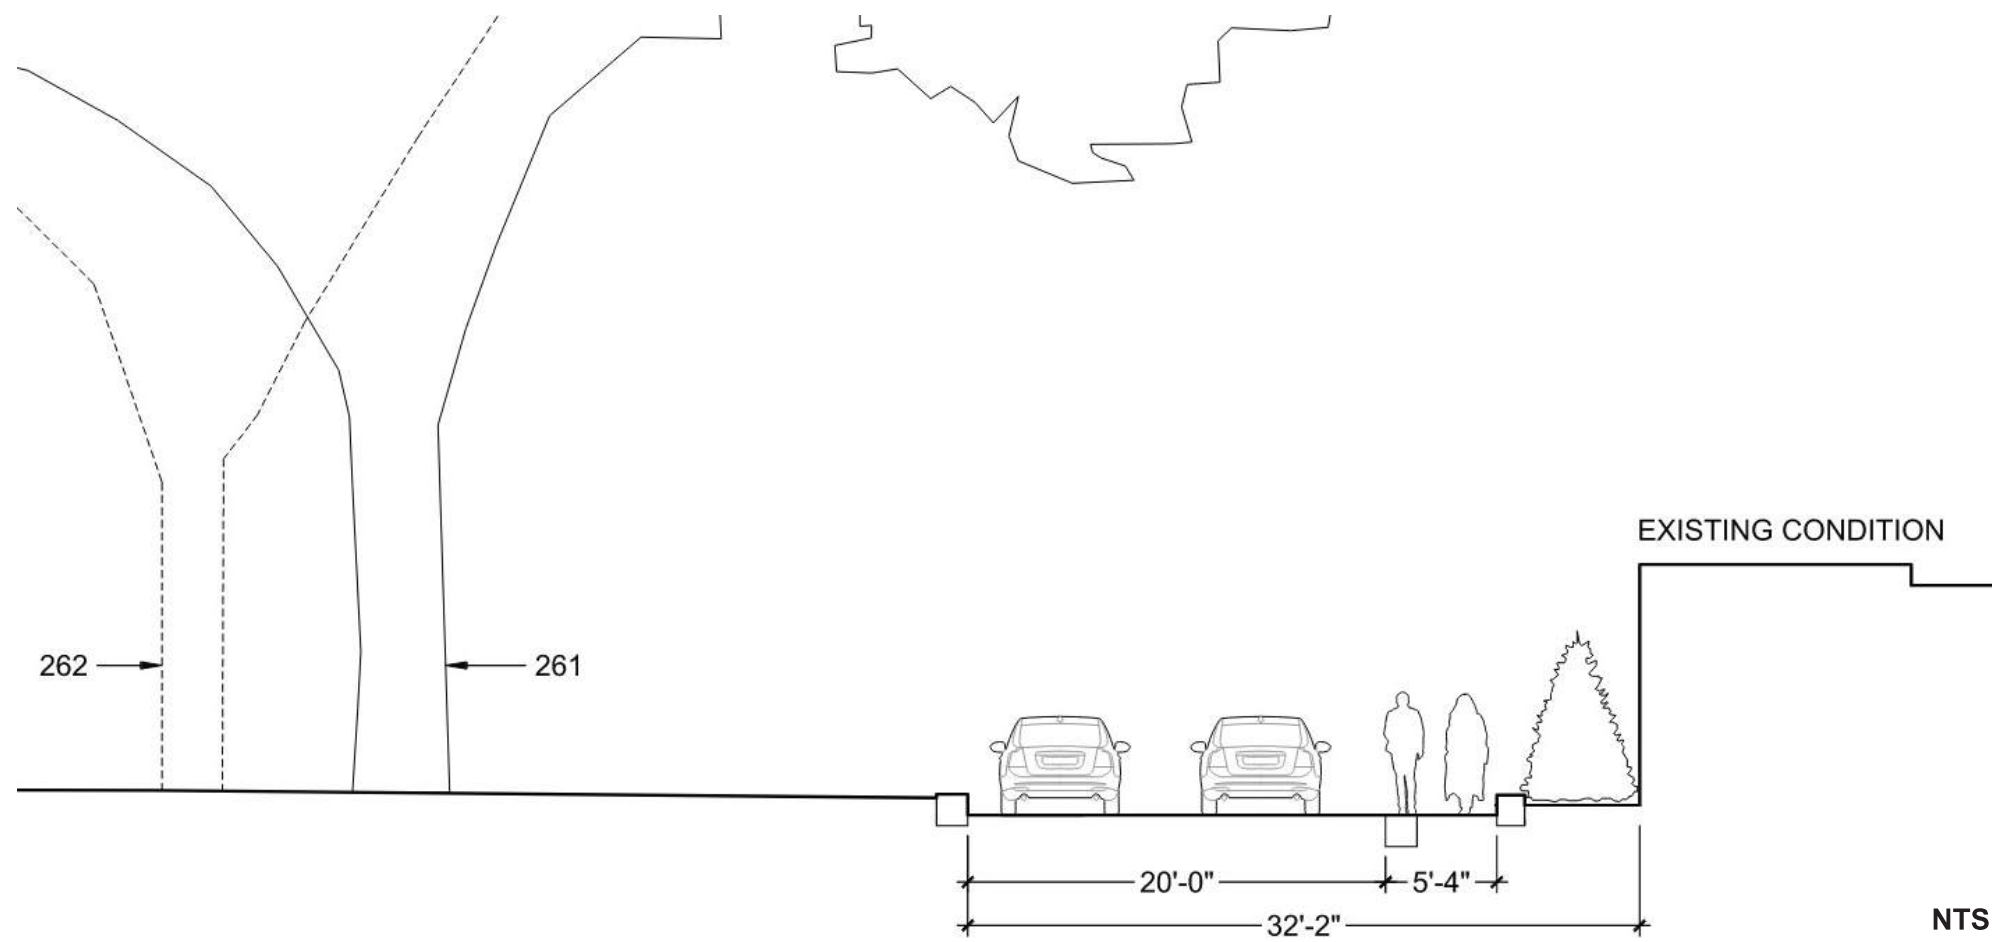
Section through existing drive, sidewalk, and moat wall.
